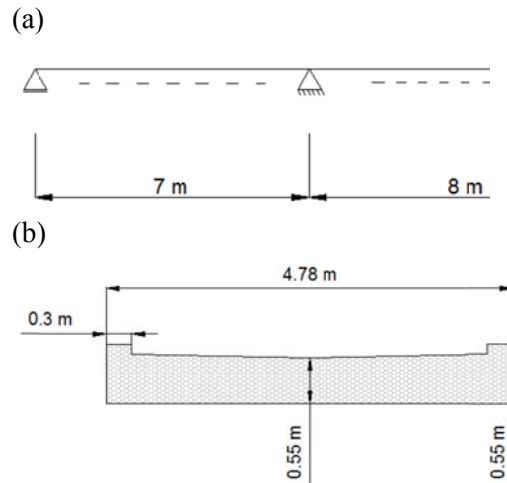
Static system of the bridge structure (a) span width of lateral and middle field , (b) cross-section of the bridge deck
